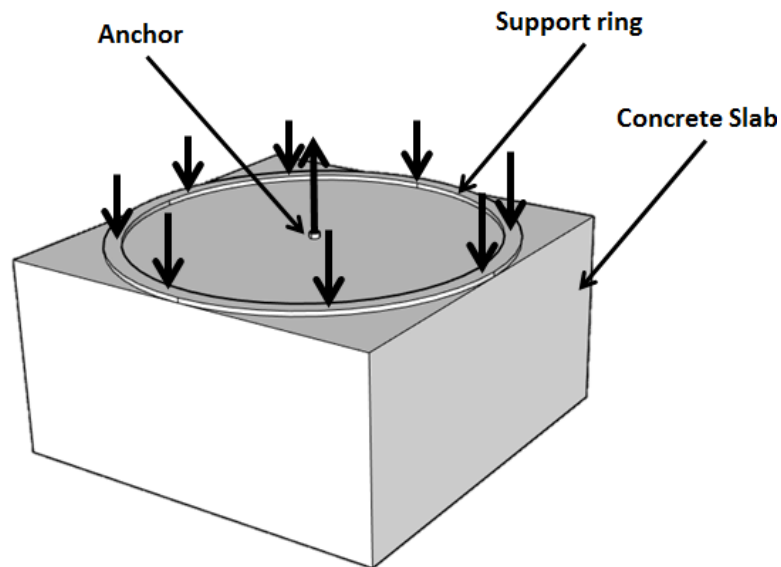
Principle sketch over slabs to be model for single anchor.
